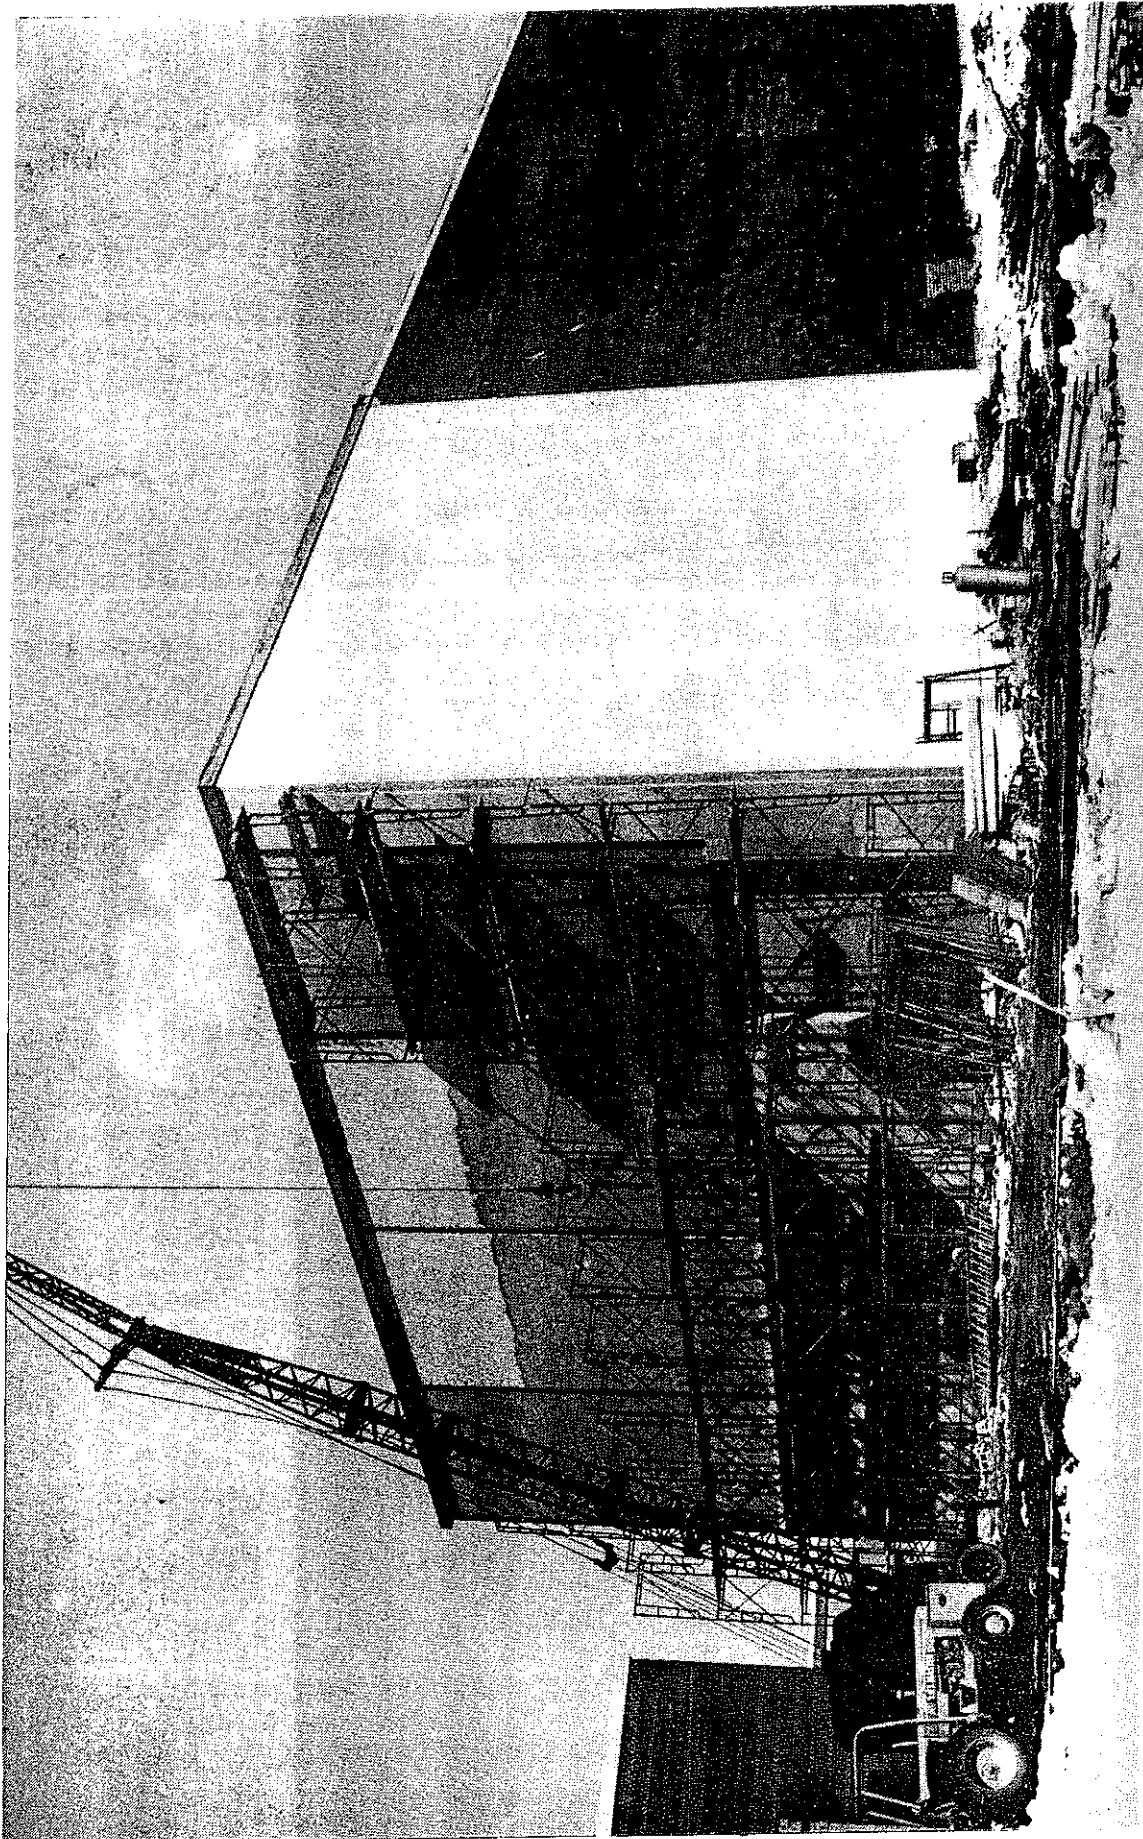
Photograph of west building addition in February 1978. At this time, interior work was already completed and the building turned over for occupancy. The principle remaining exterior work involved installation of limestone facing on the west wall.
